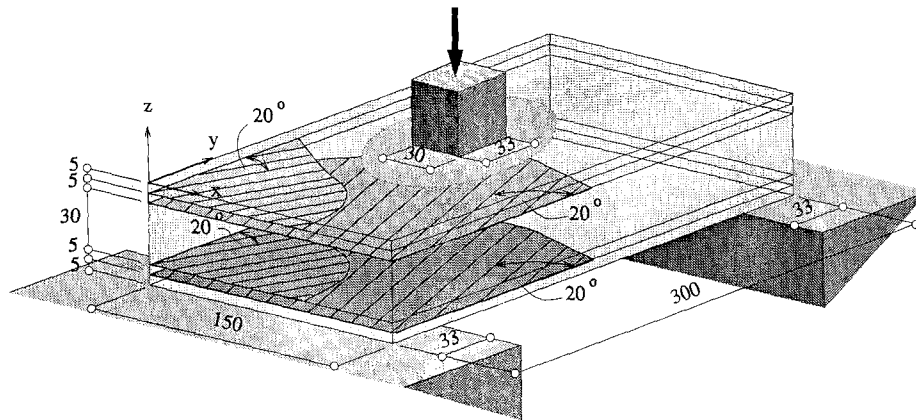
Sandwich slab subjected to punch indentation (dimensions: mm)
